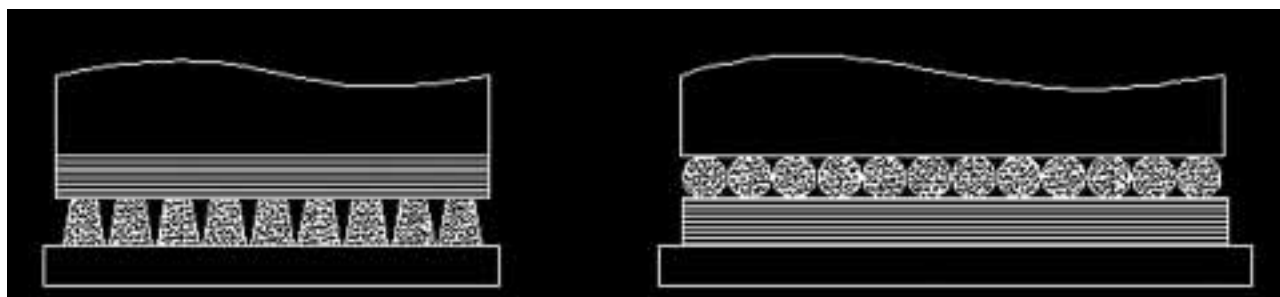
Two sides of a foundation constructed on layers of timber in many traditional buildings shown in Figure 1 (Masooleh, north of Iran).
